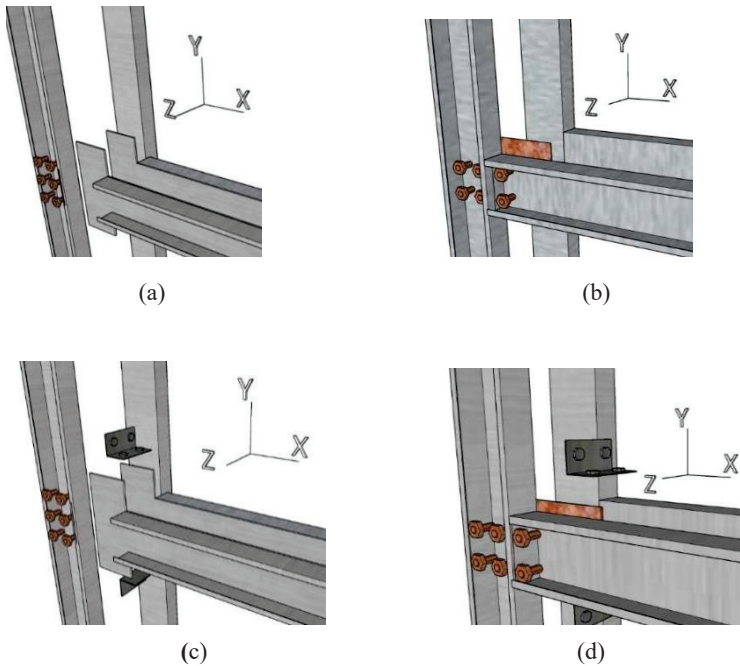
Illustration of test object, (a) screw connection. (b) screw-gusset plate connection, (c) angle cleats-screw connection, (d) gusset plate-plate joint.
